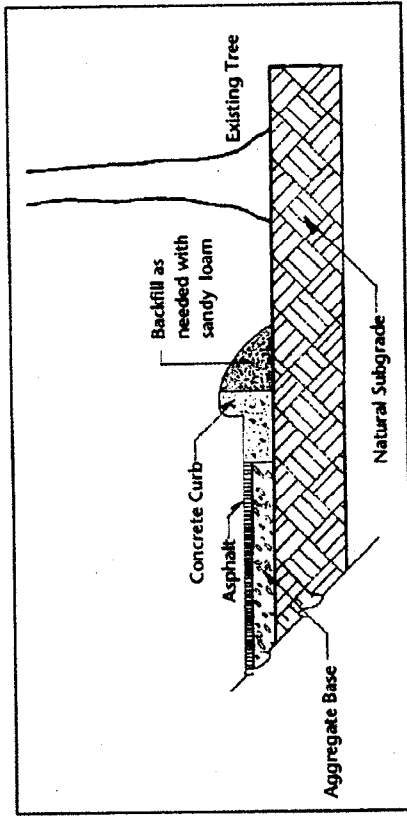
A "no-dig" type of pavement places the pavement section atop natural grade, thereby minimizing root disturbance and soil compaction. Extra reinforcement in the pavement and use of a geotextile under the base material may be needed to increase the stability of the pavement. (Adapted from a detail provided by Mary Ann Beale, City of Charlotte, North Carolina.)
